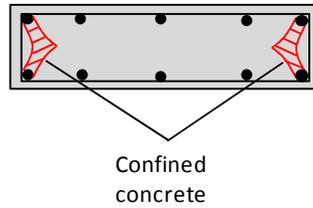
Confined concrete are at the stirrups level in the 55x15 shear wall
